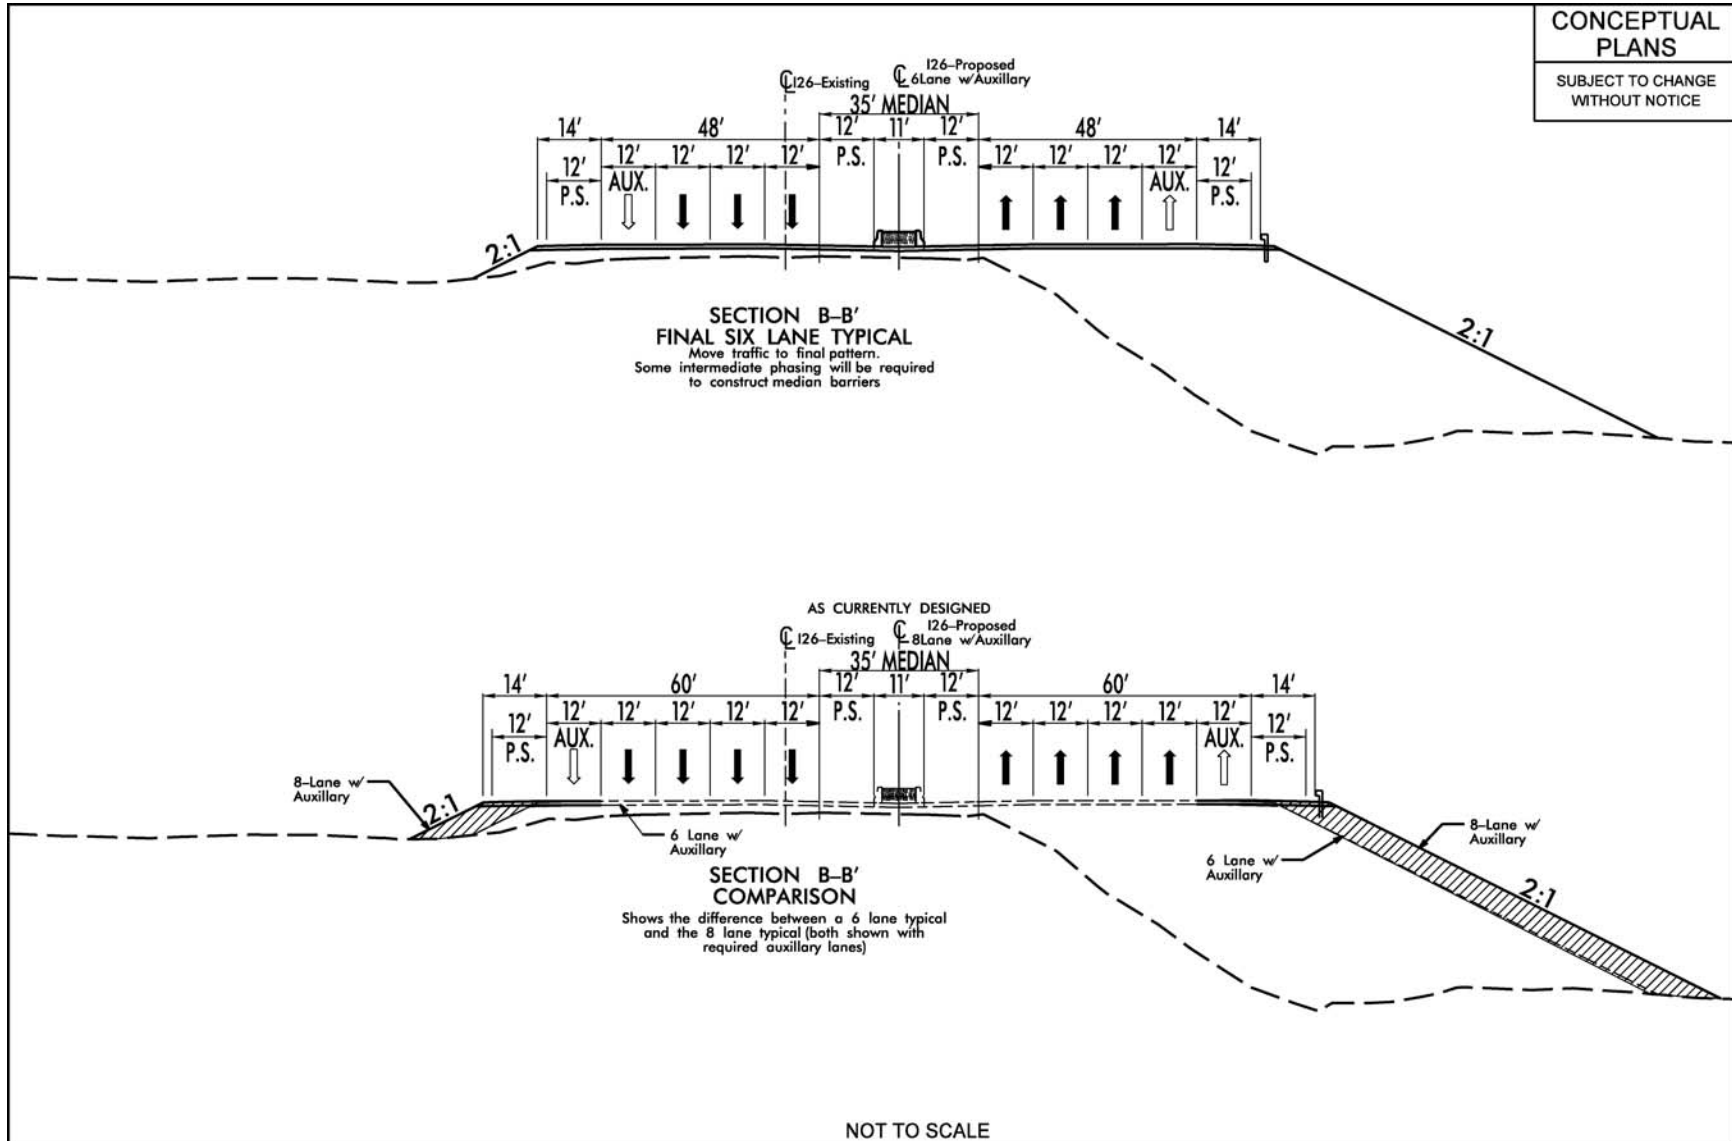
Phase Construction Concepts – North of Haywood Road Interchange
